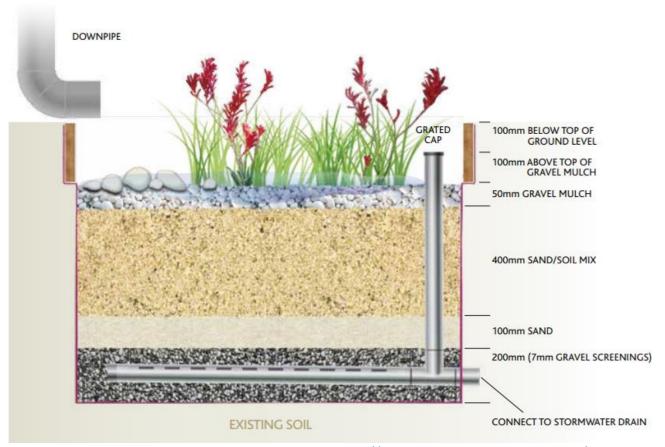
Typical Raingarden Detail (https://www.melbournewater.com.au/)
